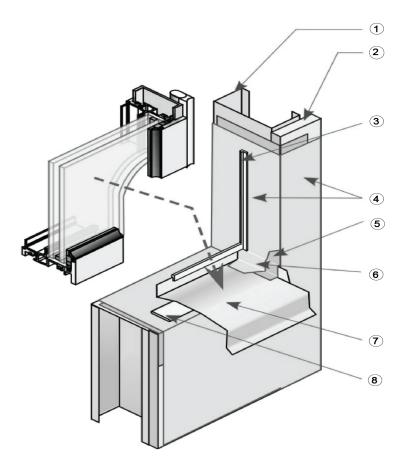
Exterior wall section – continuity at windows (NB: required insulation not shown):
